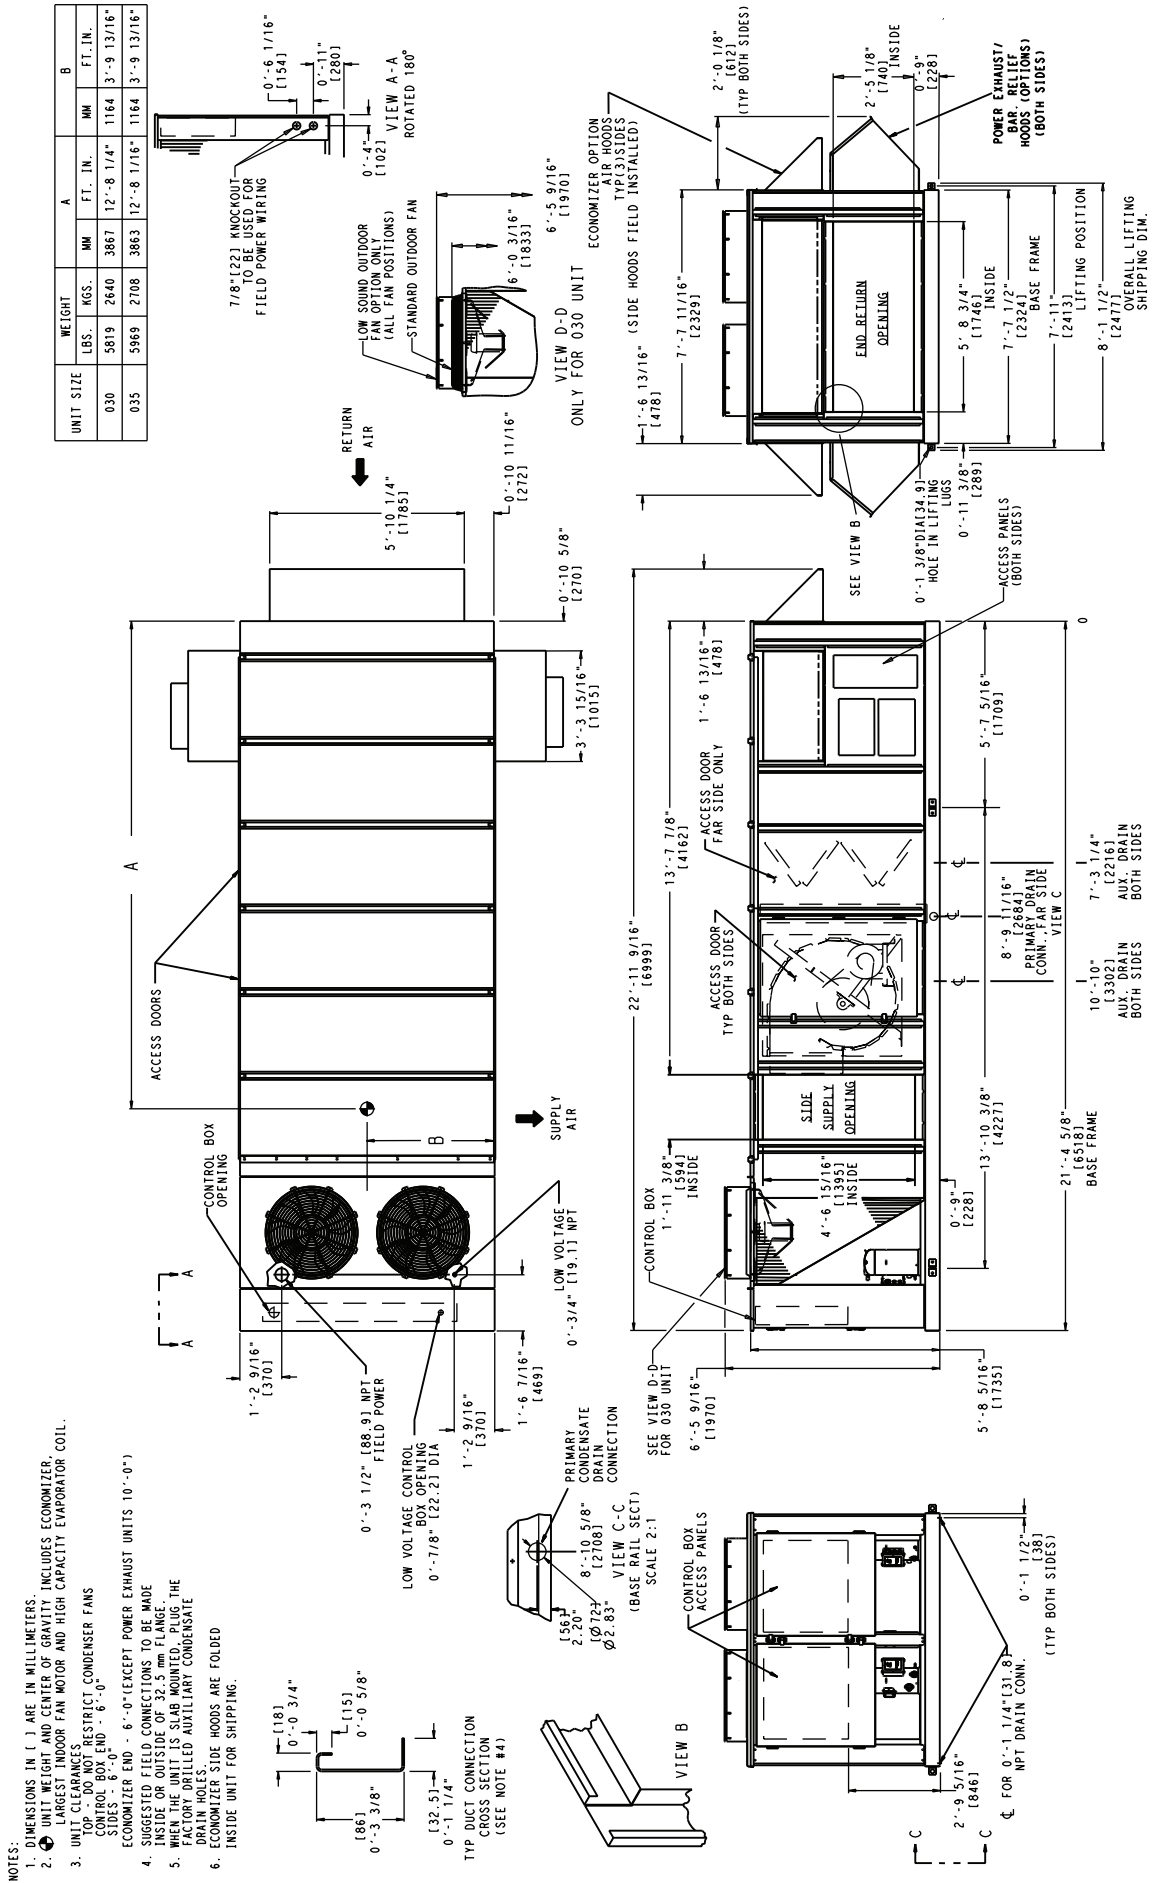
Base Unit Dimensional Drawing — 50P4, P5030, 035 (Standard Chassis Unit Shown)
